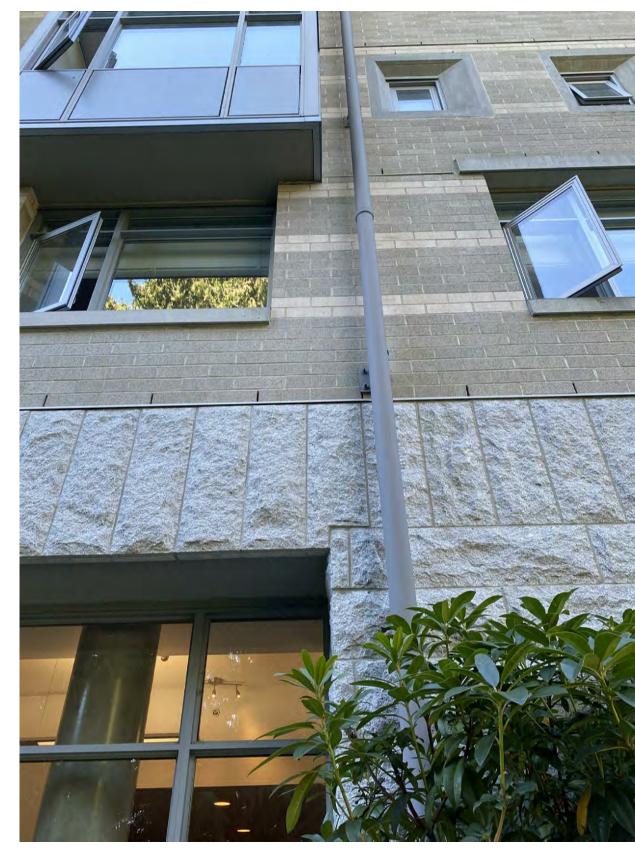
Carey Hall (Existing 2005 Building) - Details at Interior Courtyard
